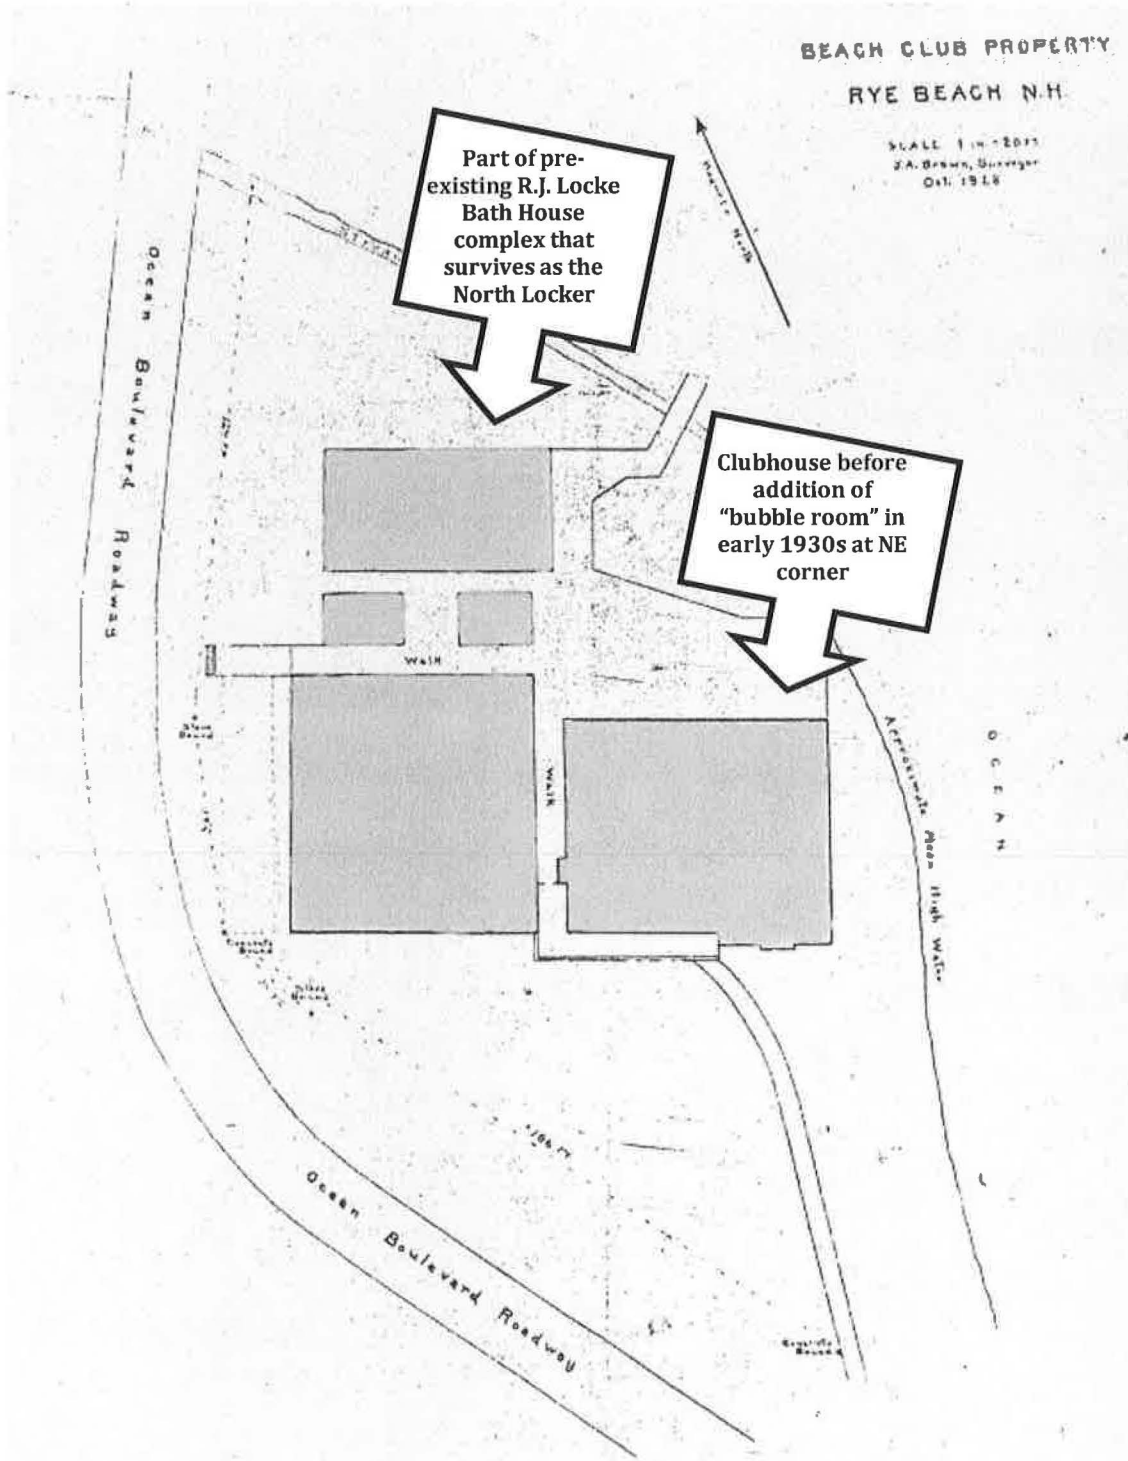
Pre-swimming-pool site plan showing Locke bathhouse layout when acquired by Beach Club in 1928
